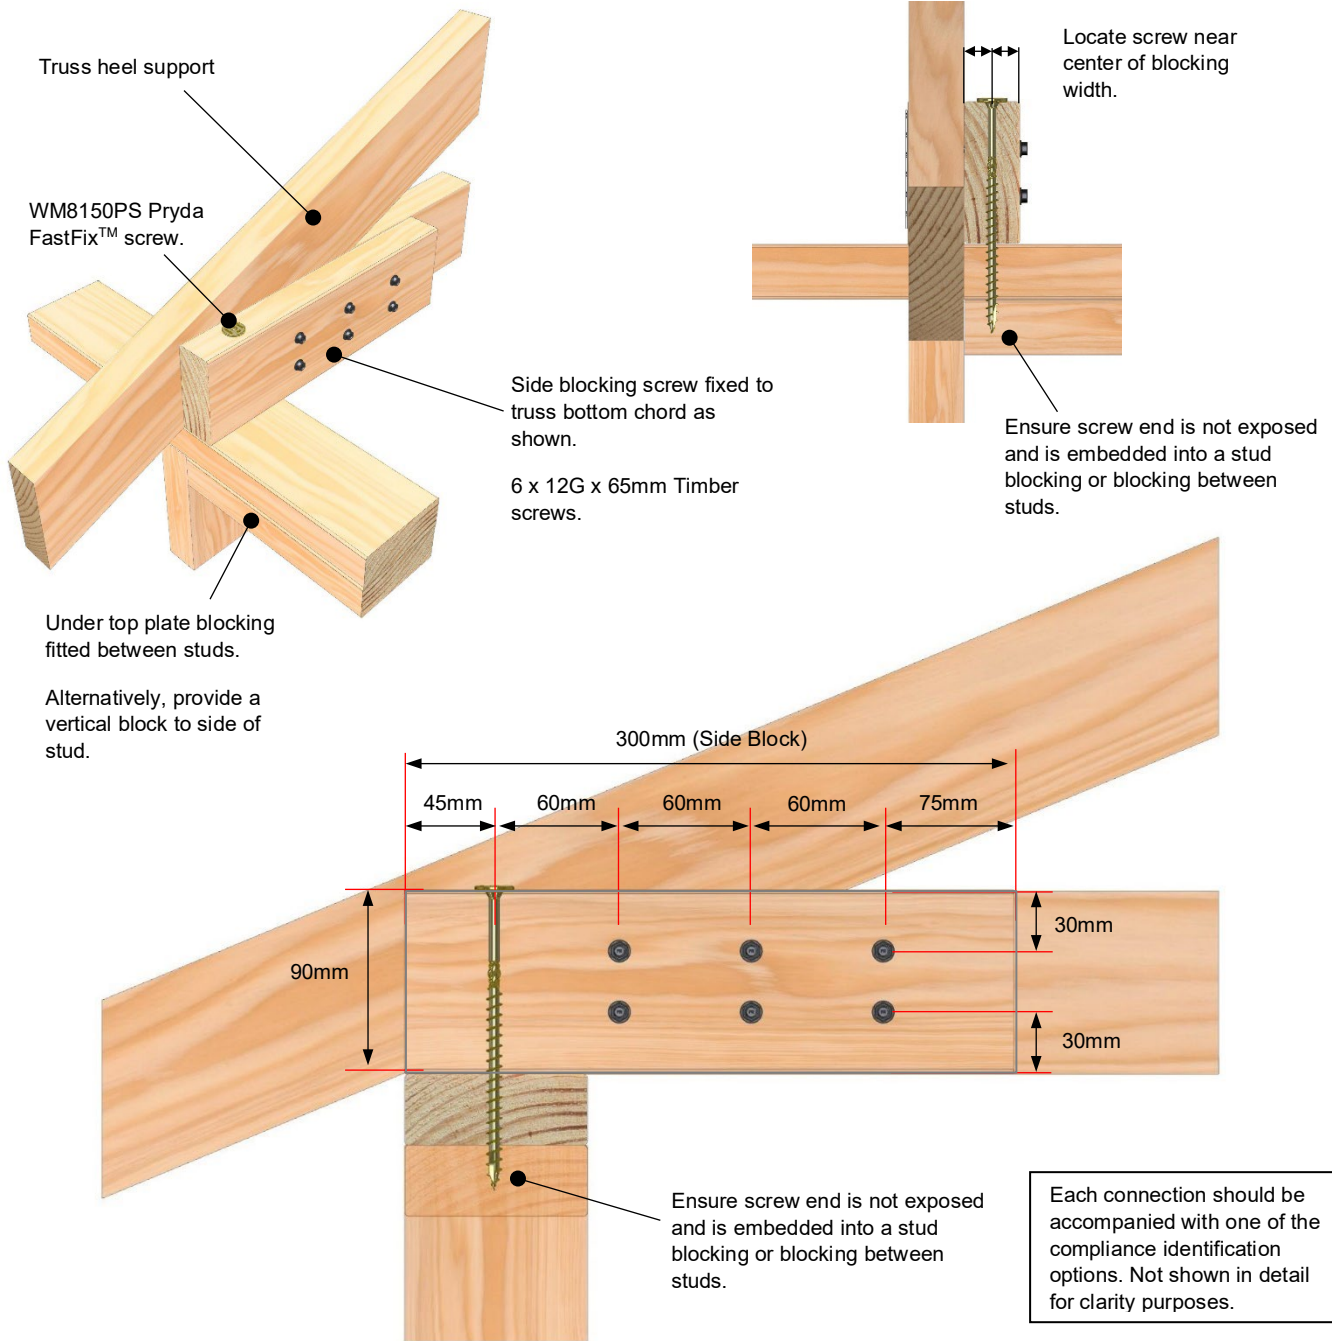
Side block fixing to truss heel to facilitate tie-down screw from top of side block.
